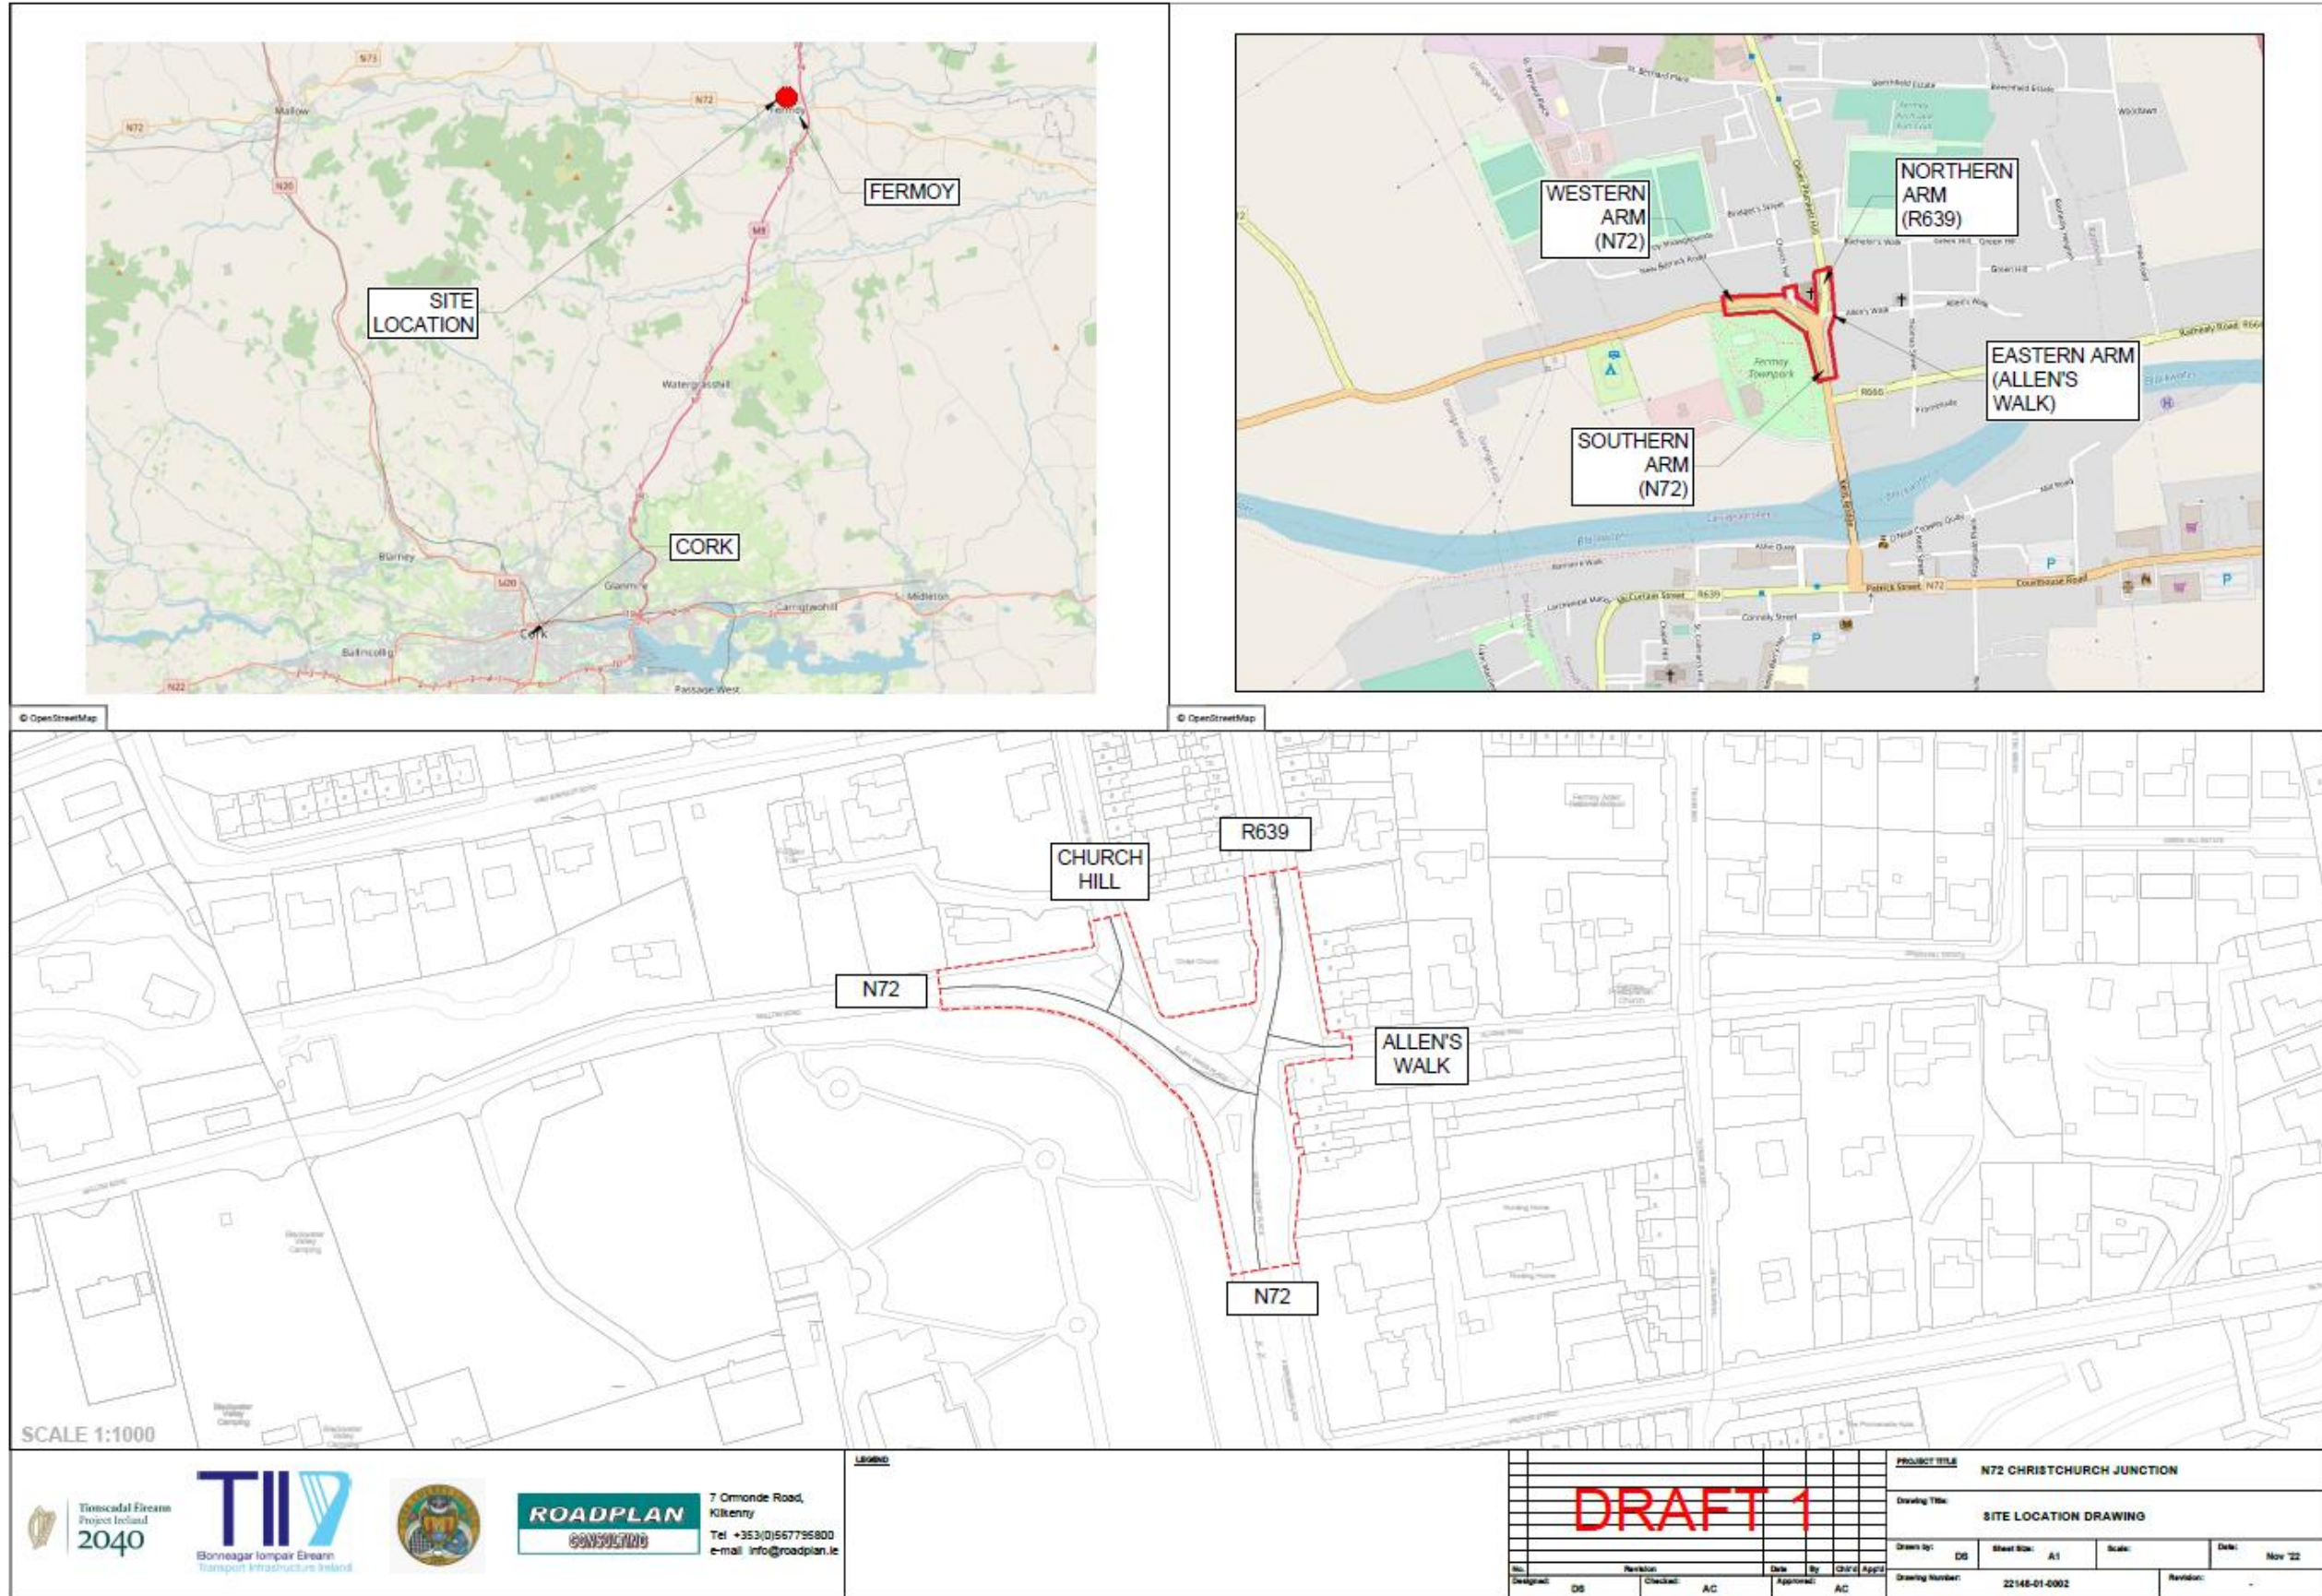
Composite plan showing location of proposed N72 Christ Church Junction works.
